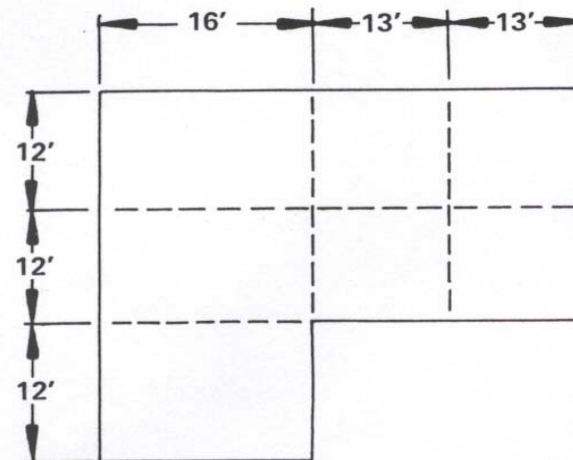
Assumed overlapping design rectangles and stiffening beam spacing
